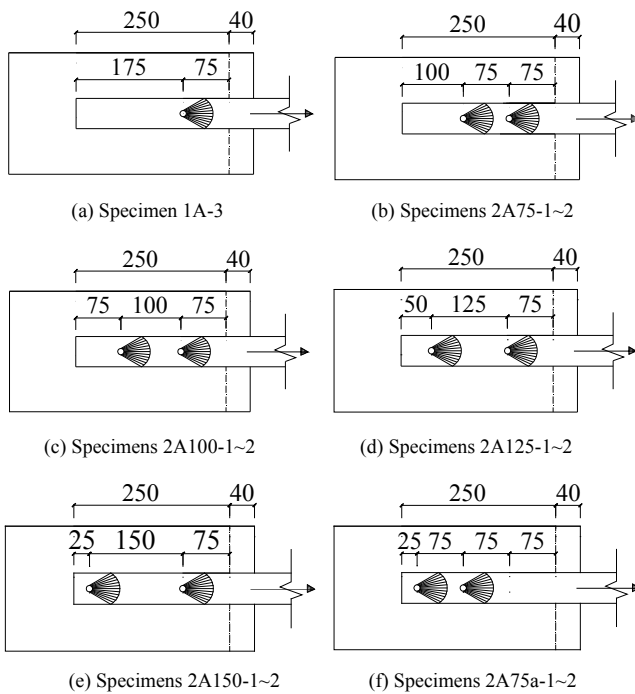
Anchor layout (e.g. 2A100-1~2 represents specimens 1 and 2 for joints with 2 anchors spaced at 100 mm)
